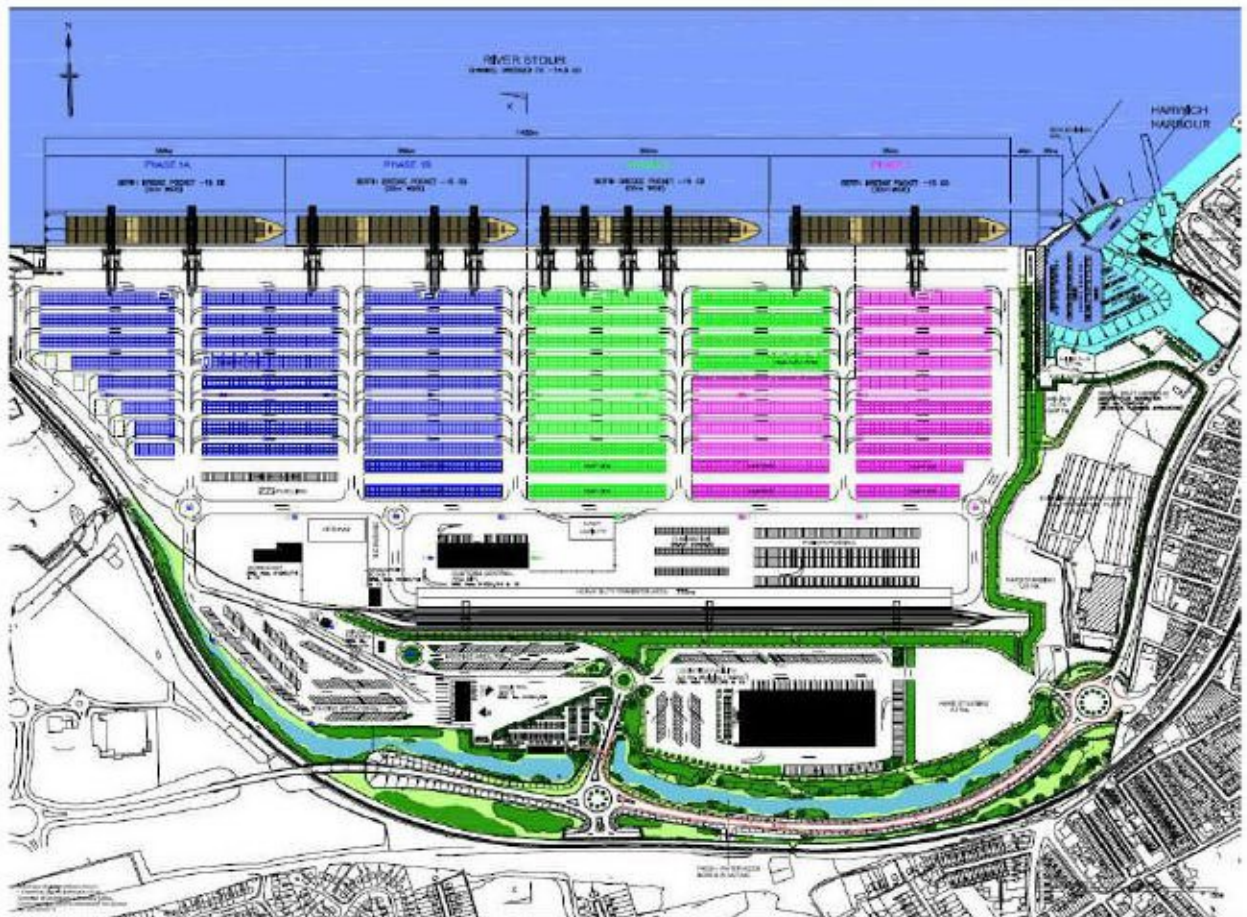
Consented Masterplan (extract from Drawing no. H1001/02 Rev A Overall Masterplan, HPUK)
